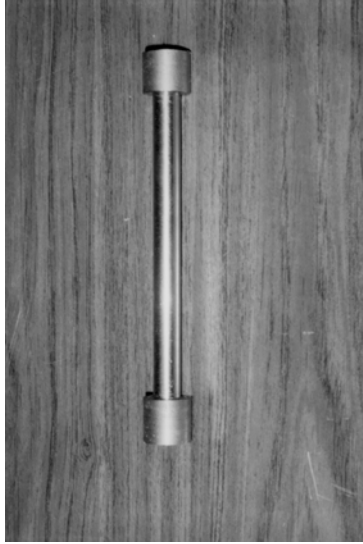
A Type A Specimen (The Same Configuration as Types C, E Specimens) before Testing
